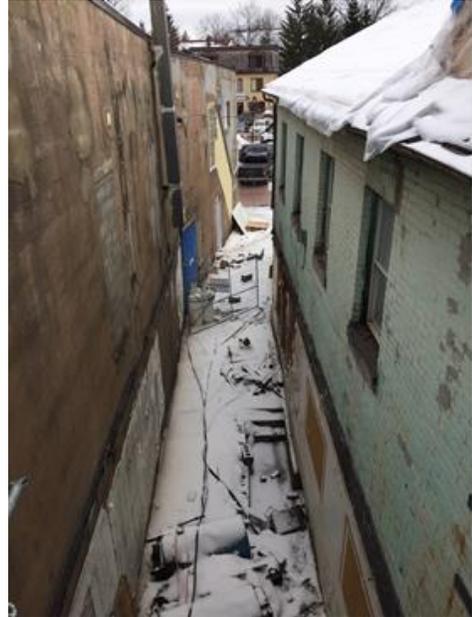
192 Main Street, between 194 Main Street (left) & 190 Main Street (right)
